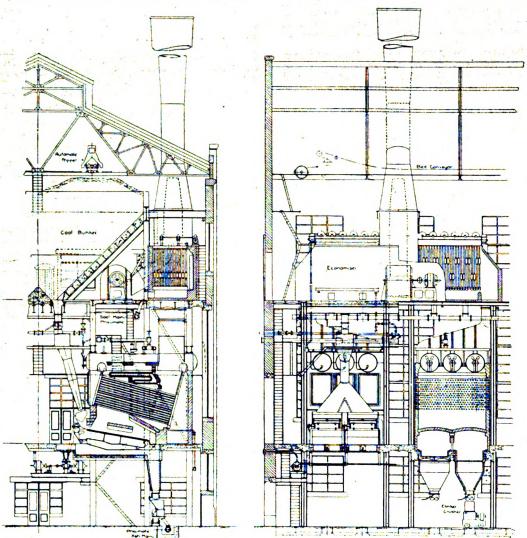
SECTIONAL VIEWS THROUGH BOILER HOUSE.
